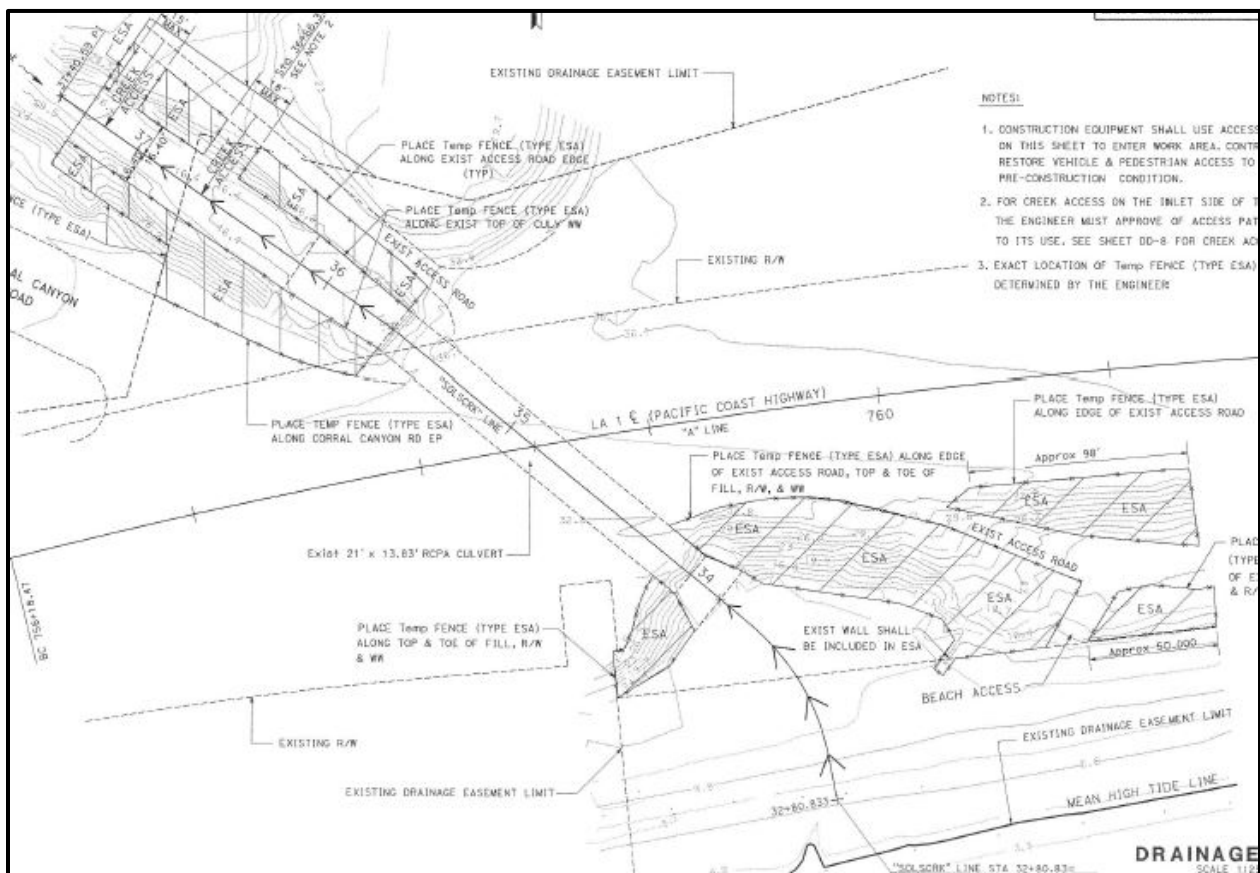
Plan view of alignment of proposed Caltrans design.
